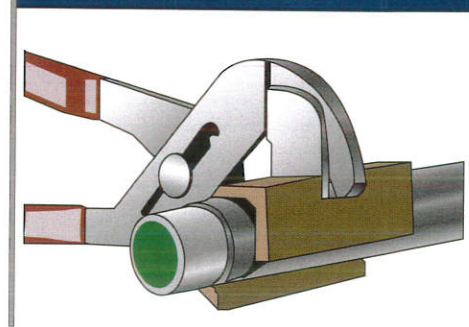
Standard tools must be specially equipped for handling PVC-coated couplings and fittings.
